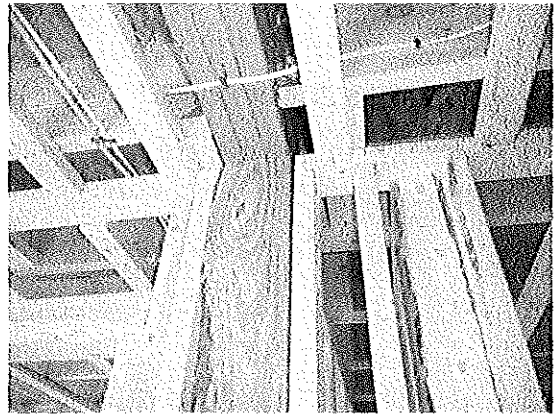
3<sup>rd</sup> Flr: Missing beam/column connector
